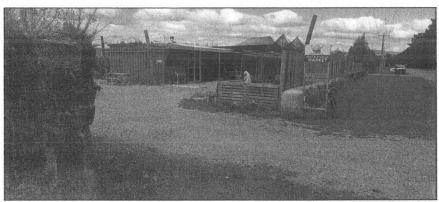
Entrance to the site. Note the tyre wall west of the entrance (left side) is full comprised of full height exposed tyres whereas the wall to the east (right side) is lower and has been partially rendered then topped with a weathered corrugated steel fence (O. McIntosh 15/03/23).
